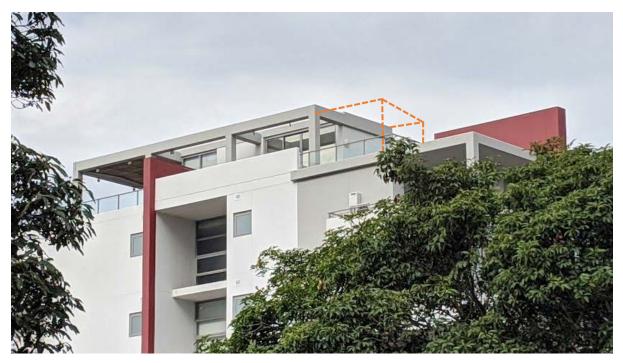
Zoomed in image of building rooftop (from north-west) showing approximation of proposed structure
